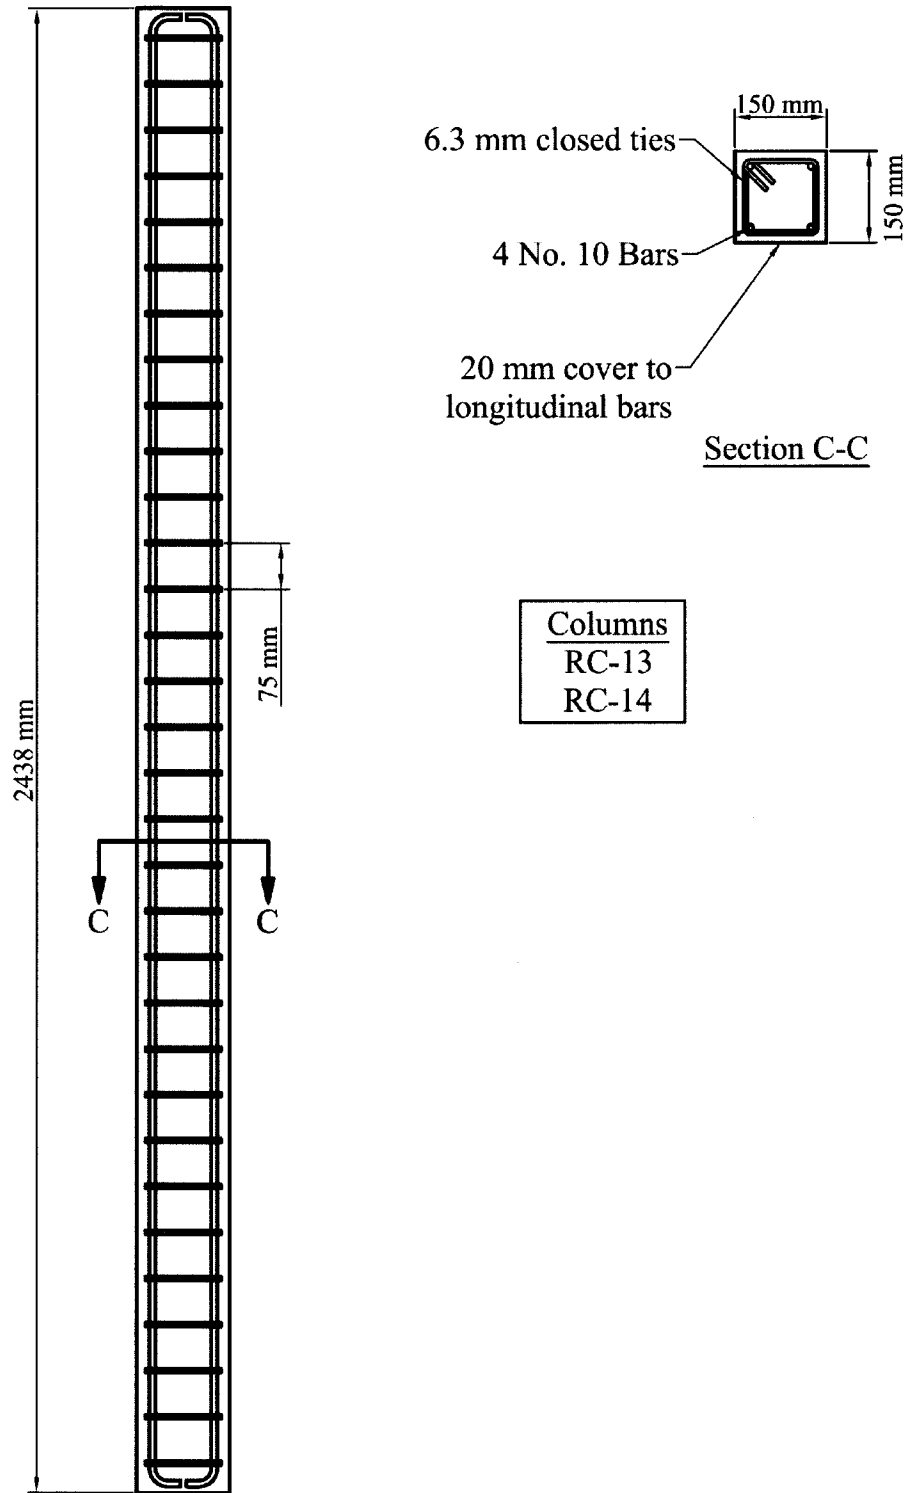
Reinforcement Details of 150x150 mm Non-Seismic Columns
